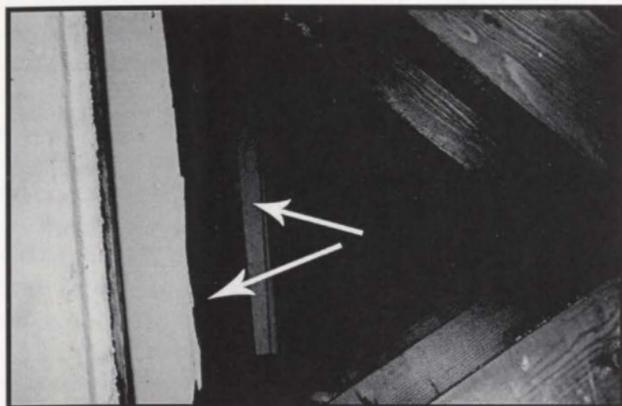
North side of the Temple attic, where recycled pieces of historic exterior siding have been used as vertical bracing elements. Siding has also been used throughout the attic for both diagonal and horizontal bracing members.
